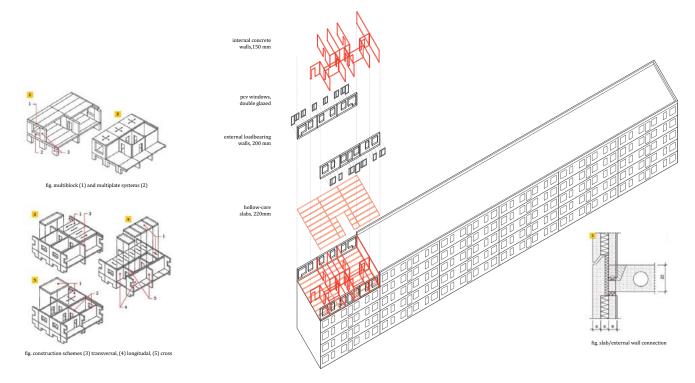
Standard prefab concrete multifamily house and its construction elements; own work
